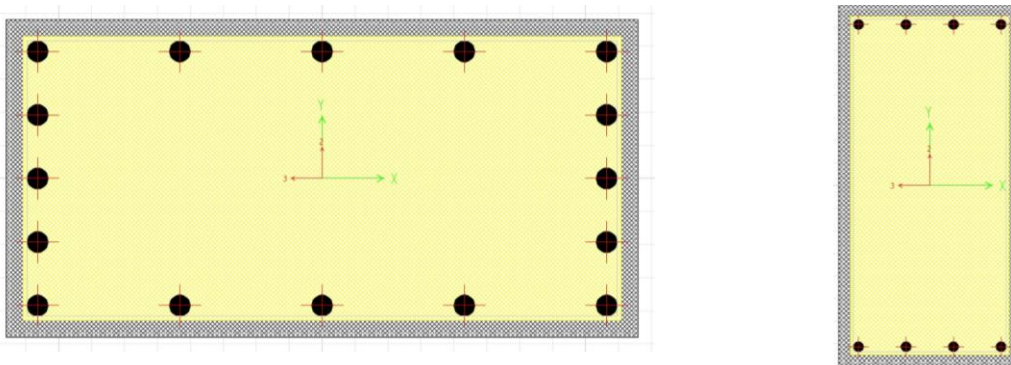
Reinforcement layouts of columns (left) and beams (right).
